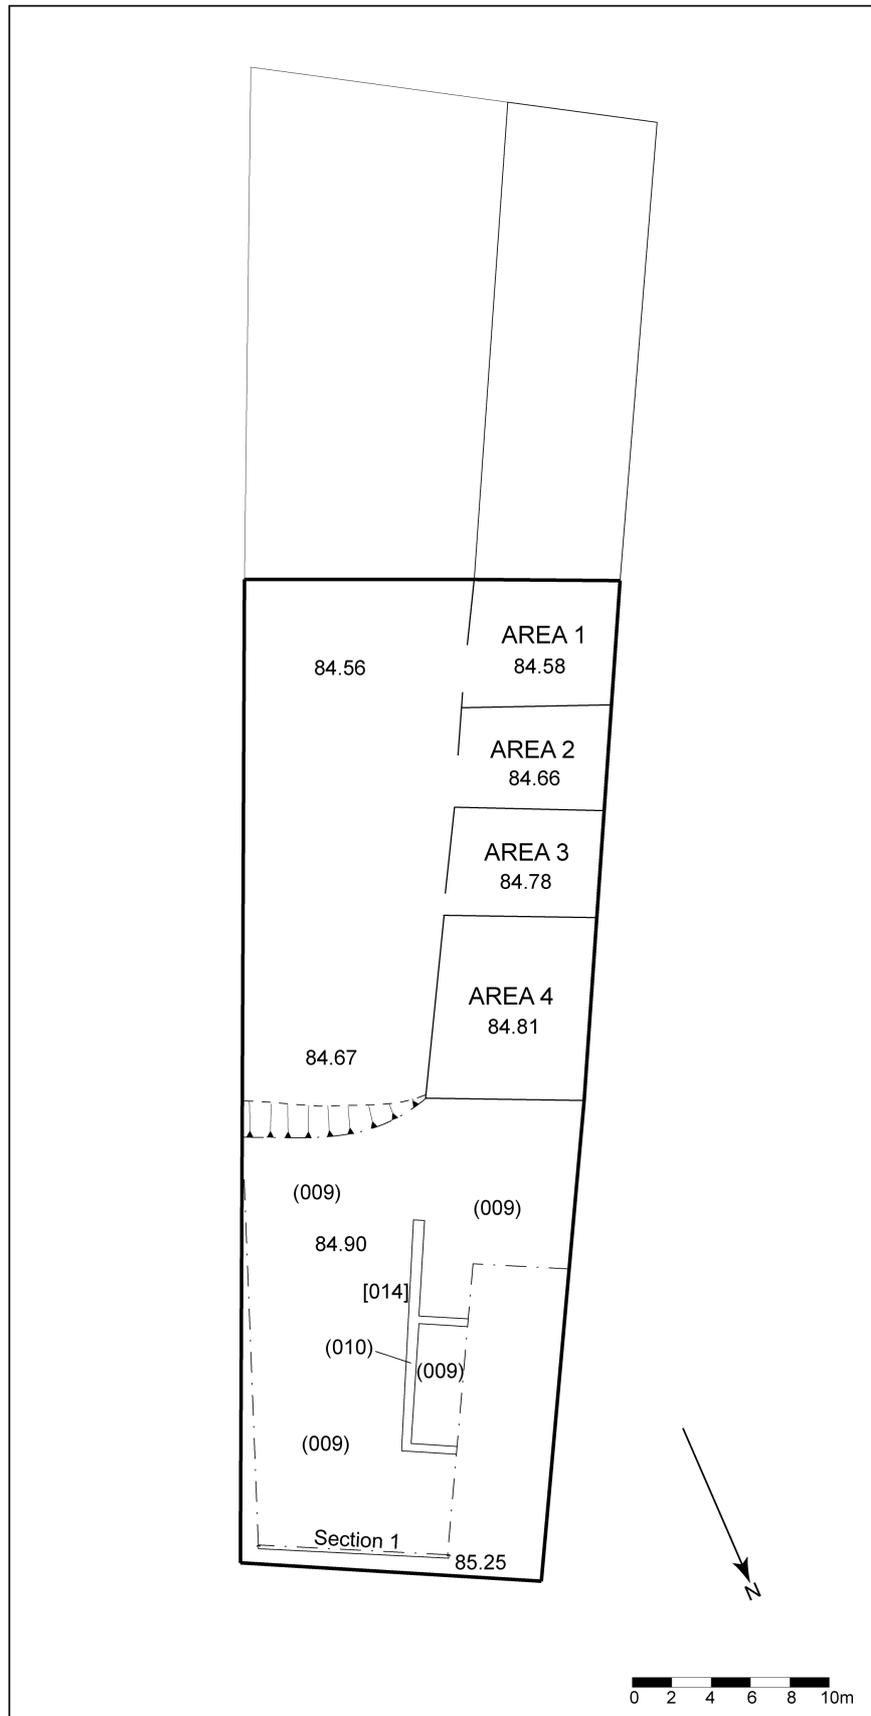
Plan showing features revealed during observation of groundworks at Stableton House
